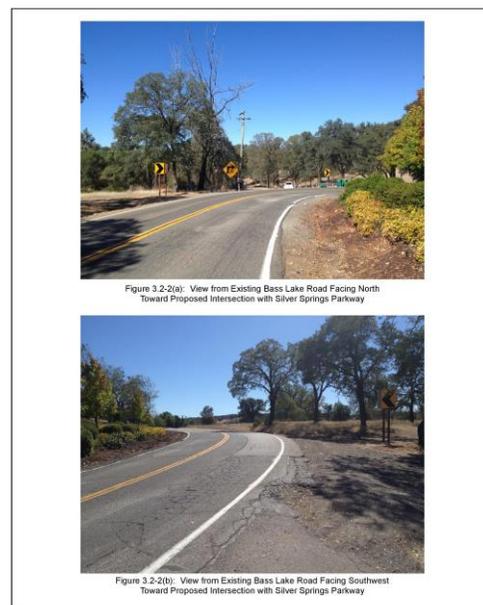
(a): View from Existing Bass Lake Road Facing North Toward Proposed Intersection with Silver Springs Parkway
